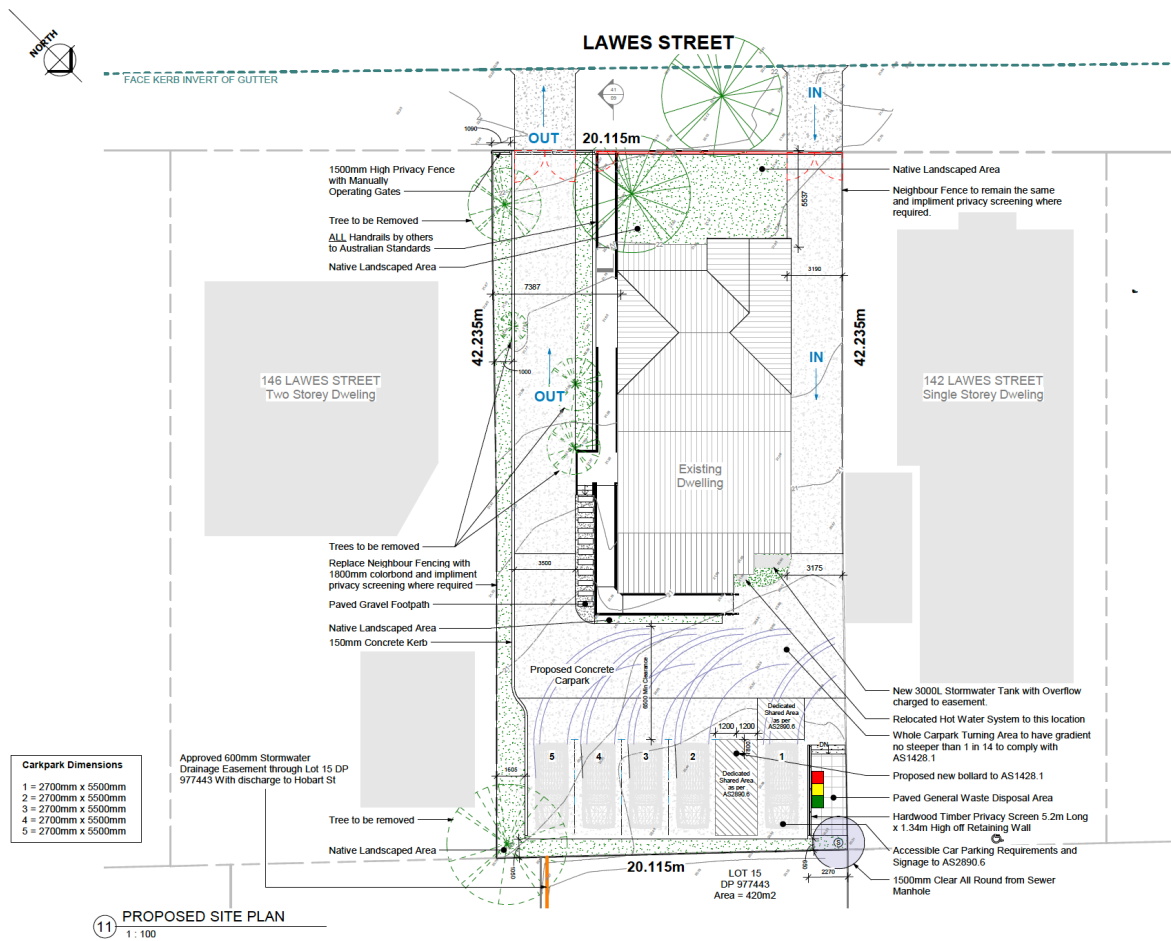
Site Plan of the subject site (Source: Hoover Group)
